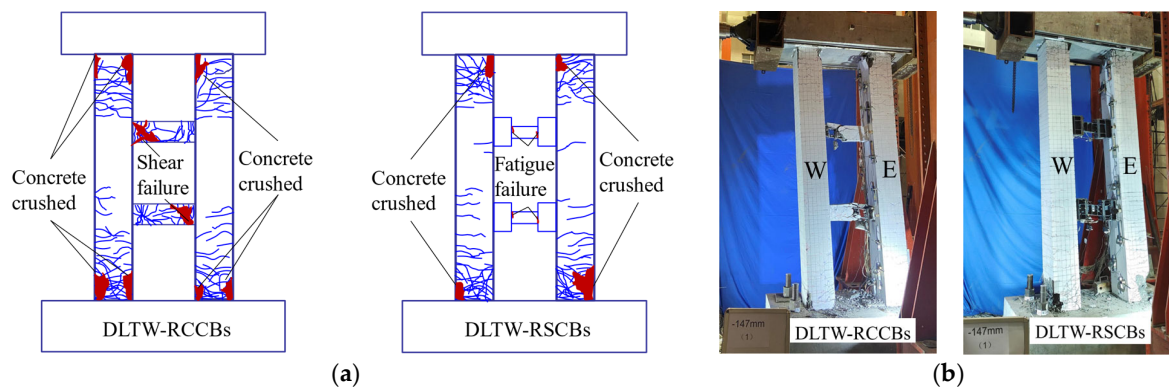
Crack distribution and overall view of damage failure for the DLTW-RCCBs and DLTW-RSCBs specimens (drift ratio 4.9%). (a) Distribution of concrete cracks. (b) Overall view of damage failure.
